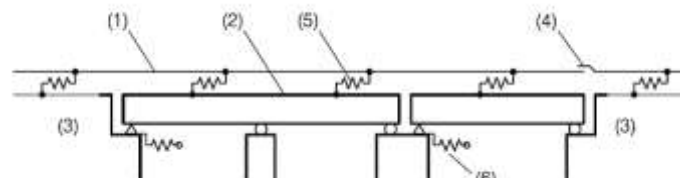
Typical cross-section of the railway bridge deck showing track components and structural arrangement.
